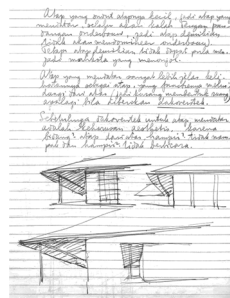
Silaban’s sketches of the space below the roof and eaves⁸⁾
